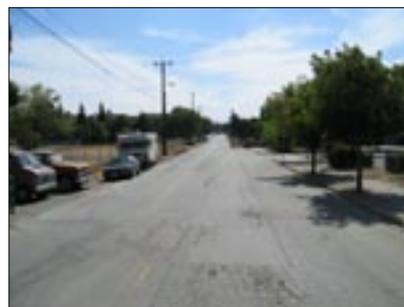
West on Valle Vista Avenue from Mission Boulevard
